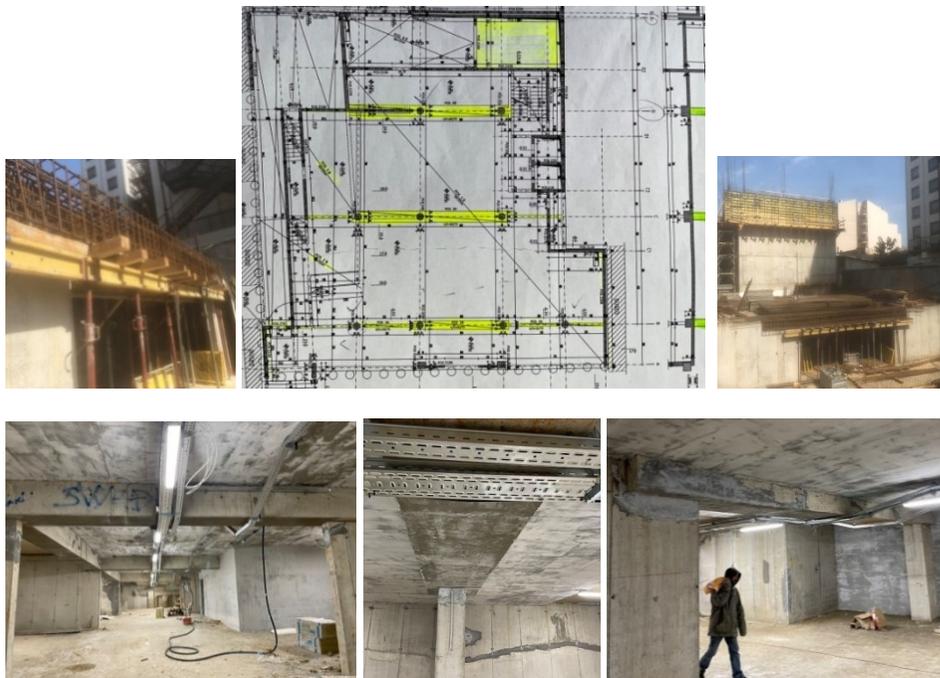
Transverse beams $b / d = 80/70$ for supporting the columns to the roof slab
